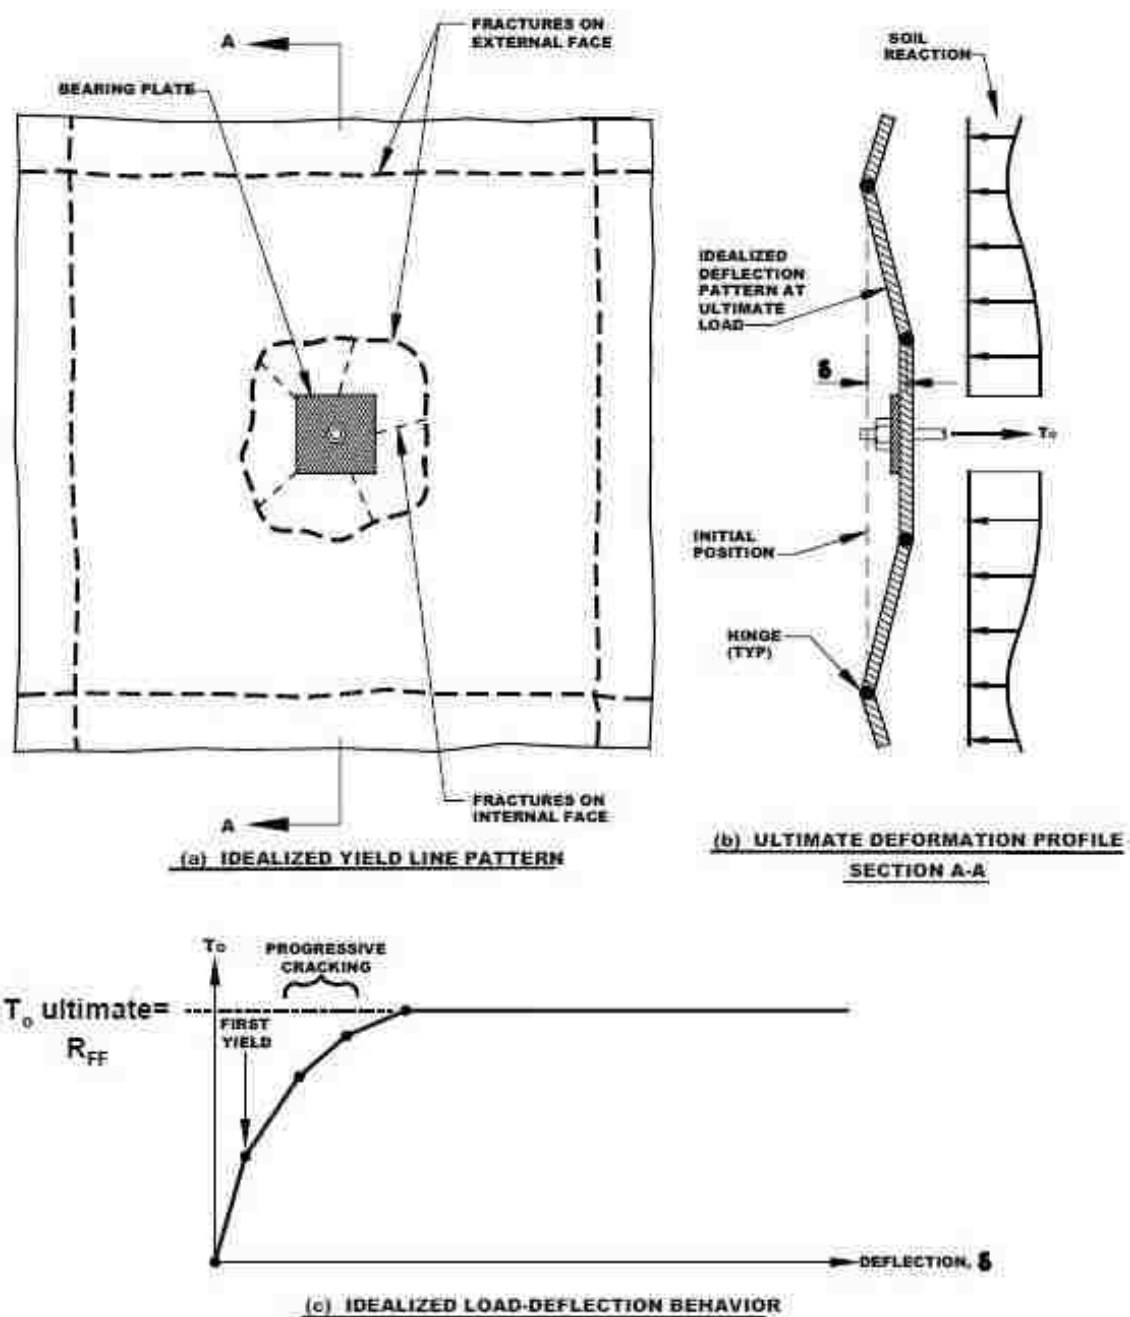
Progressive flexural failure in wall (Lazarte et al, 2003)
